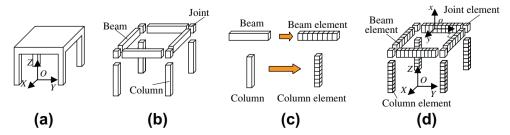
Beam-column-joint discrete system: (a) floor of structure, (b) beam, column and joint, (c) beam and column elements, and (d) discrete system.
